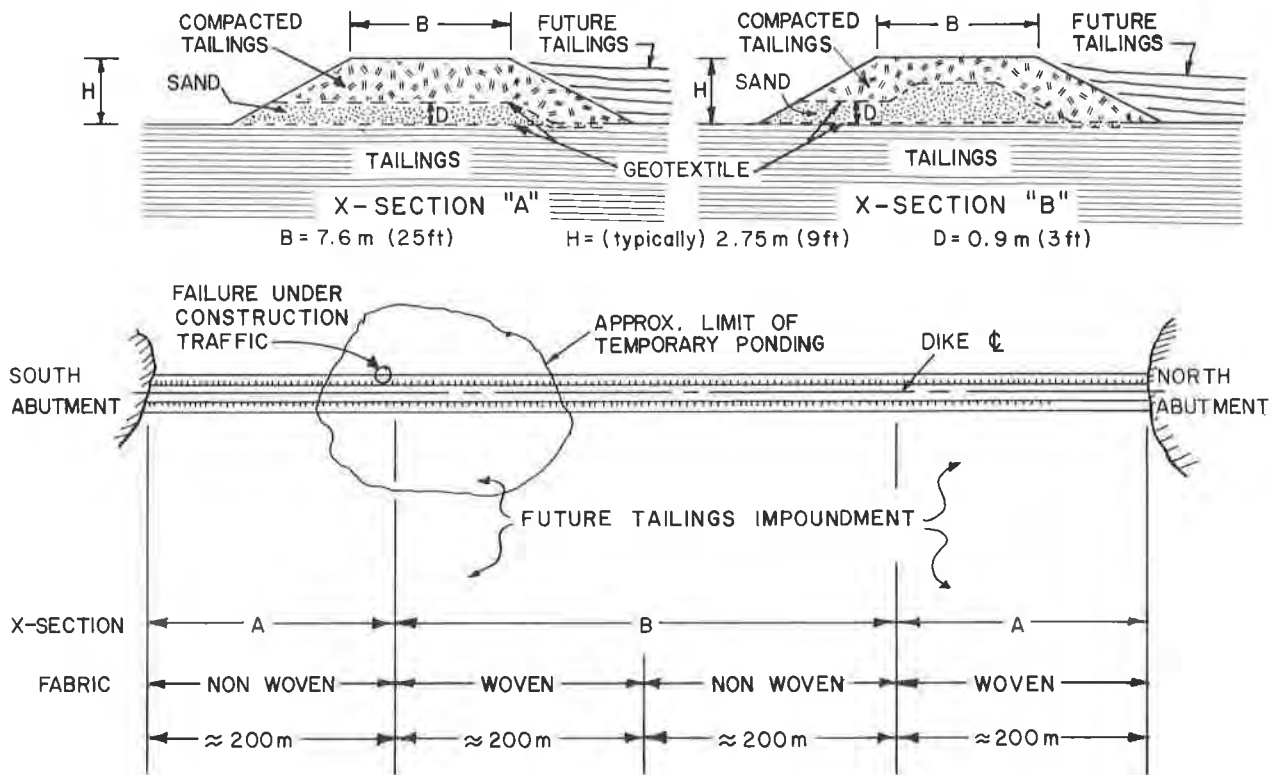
Typical Cross-Sections and General Plan of Experimental Tailings Dike
